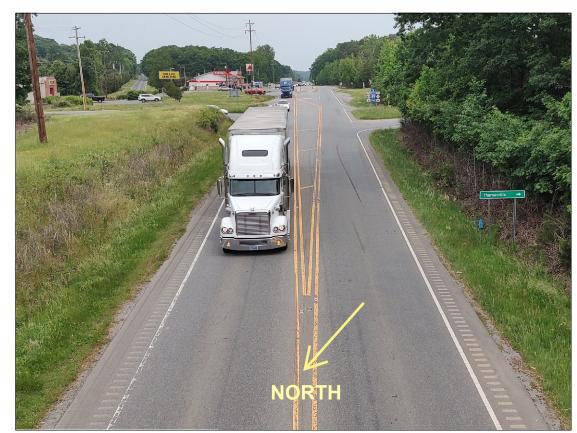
VIEW LOOKING SOUTHEAST ALONG US 64 FROM EXISTING BRIDGE DECK.
